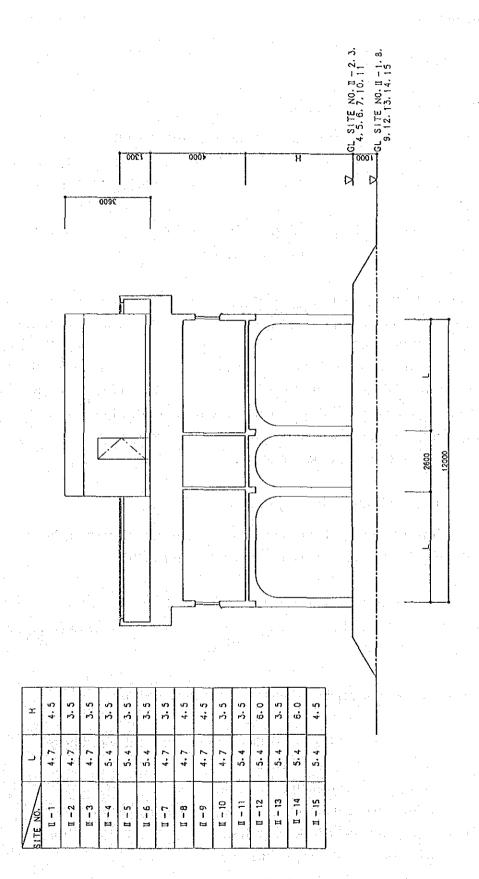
SECTION (COMMON TO EACH TYPE)
